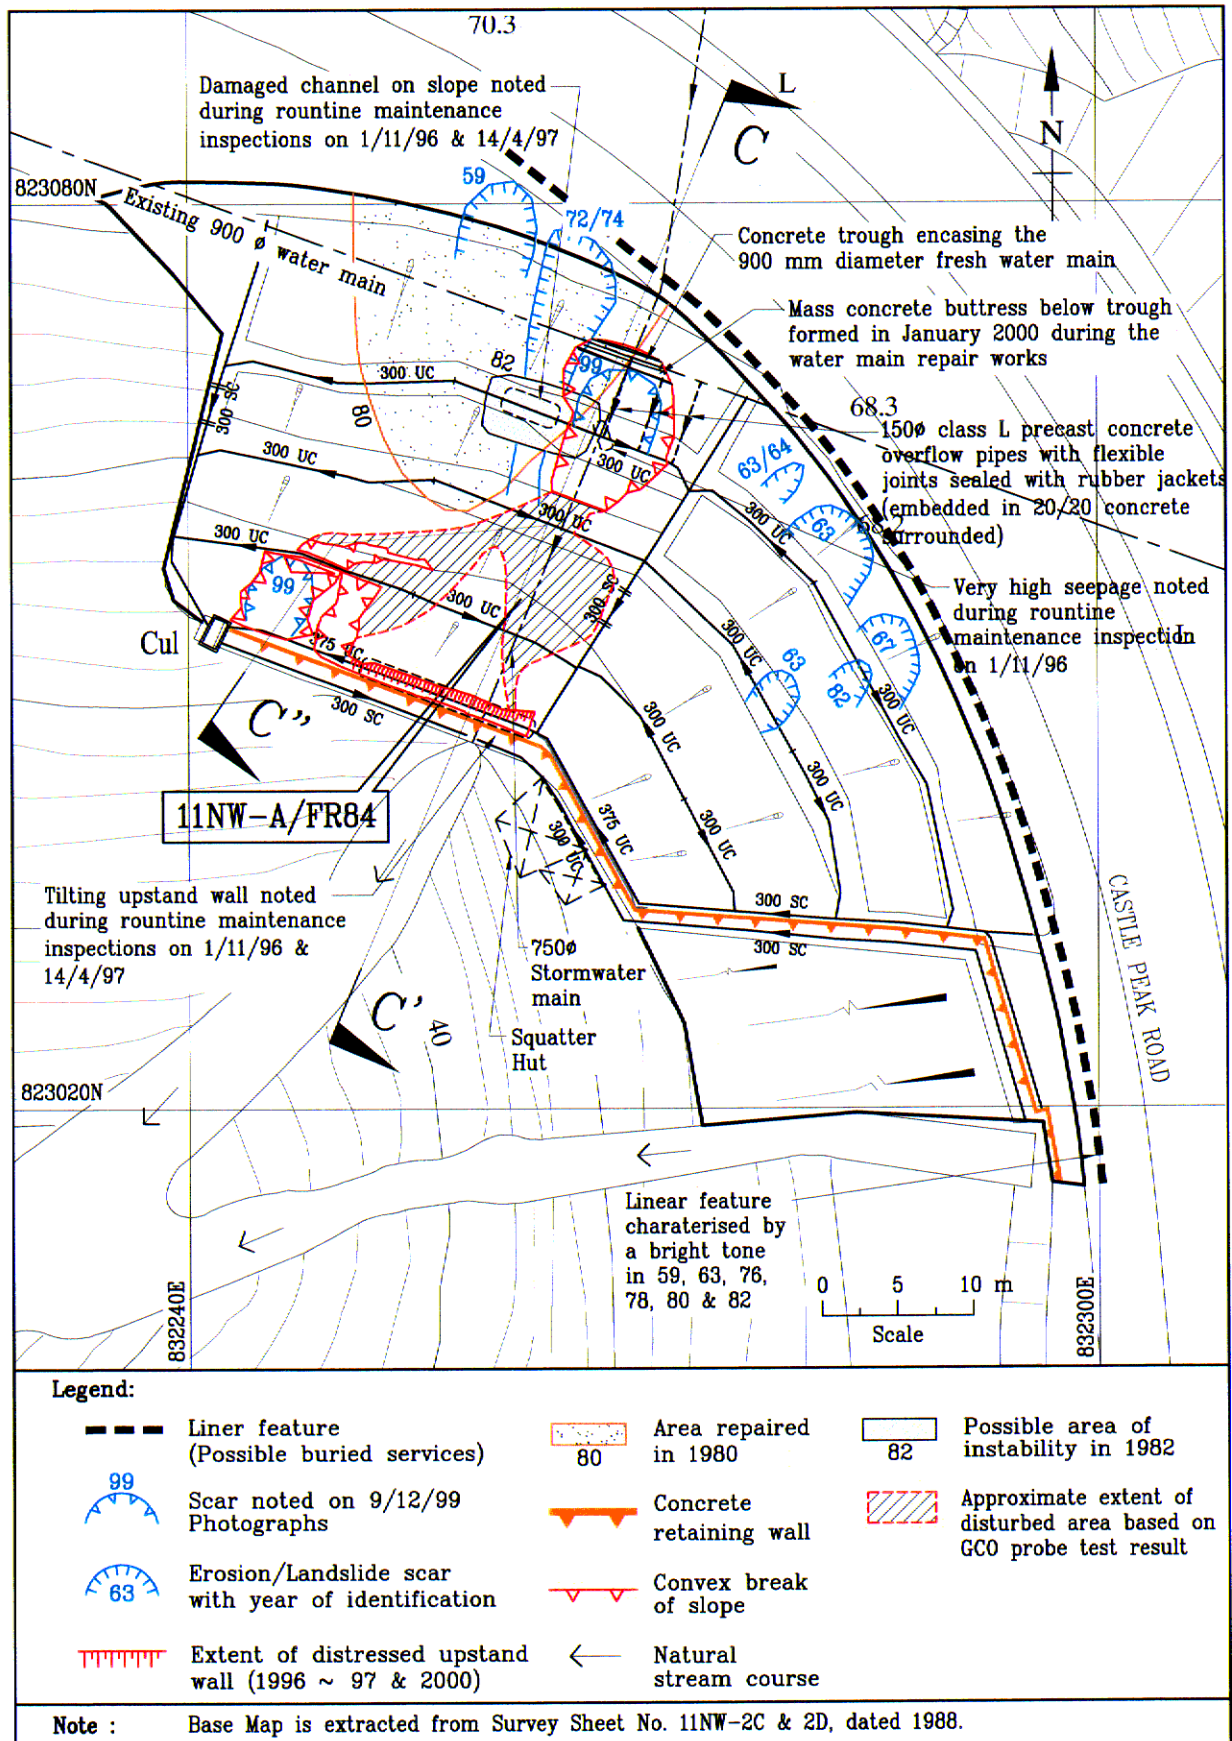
Plan Showing Signs of Distress at the Landslide Site
